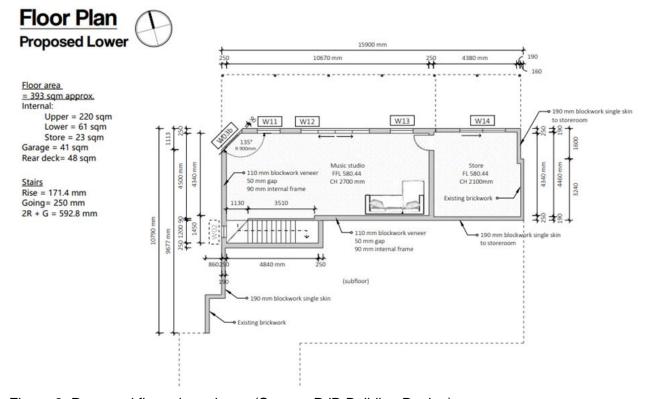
Proposed floor plan – lower (Source: PdD Building Design)
